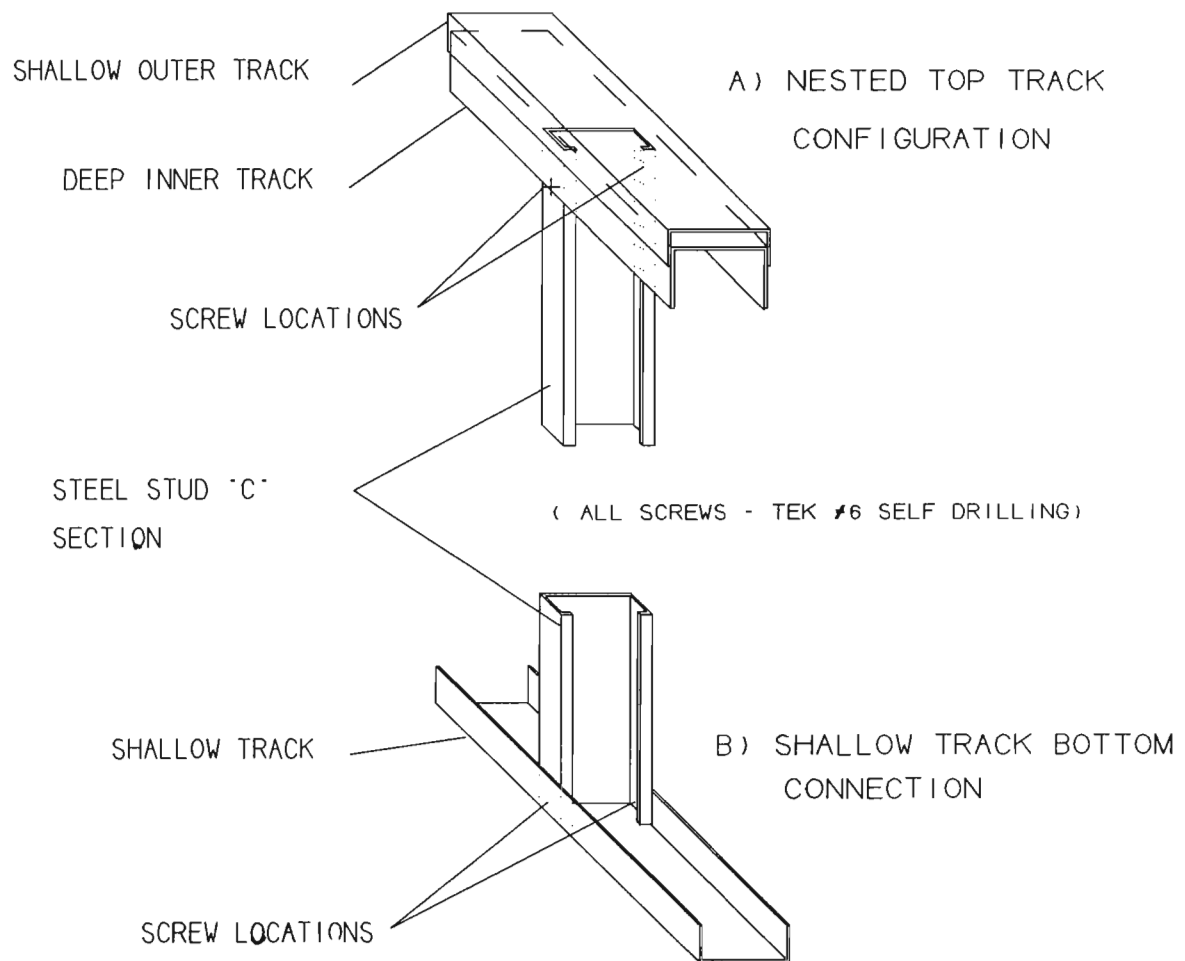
TYPICAL STUD/TRACK CONNECTIONS
